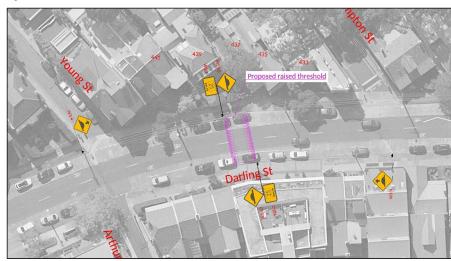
Darling Street between Young Street and Hampton Street proposal.
